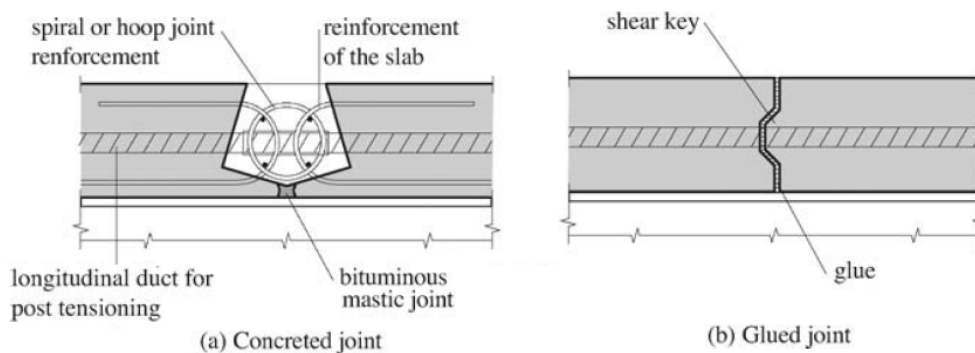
Longitudinal sections of joints in precast slabs (Lebet & Hirt, 2013)
